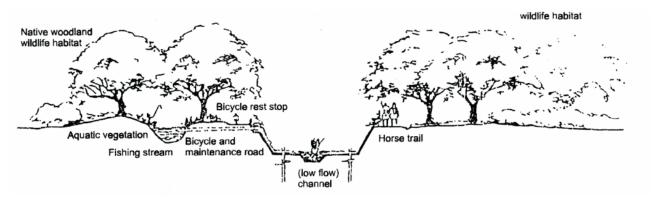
Proposed landscape of Najafgarh Drain, Dwarka, Delhi) Source: Jain A.K., Landscape Architecture, Discovery Publishing House, New Delhi
